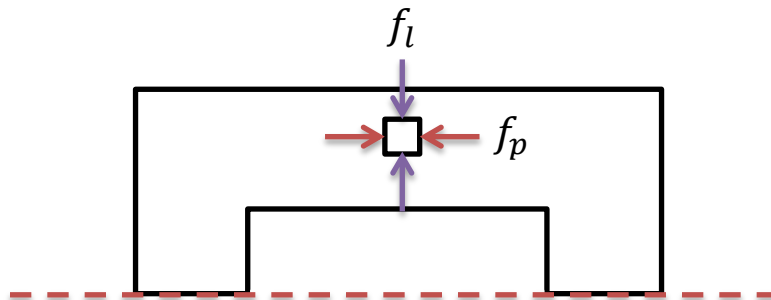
Stress State within Concrete Wall of Hollow Rectangular Columns
